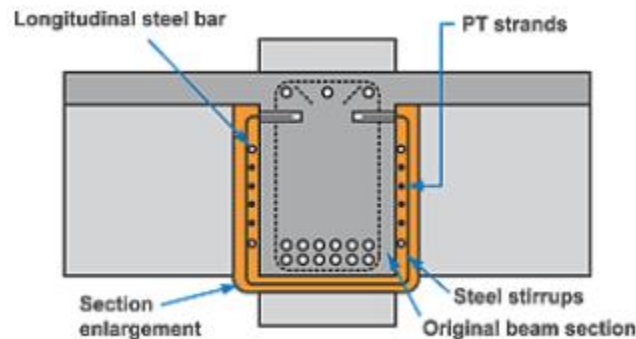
Cross section of a prestressed beam strengthened by Section Enlargement Technique [19].
